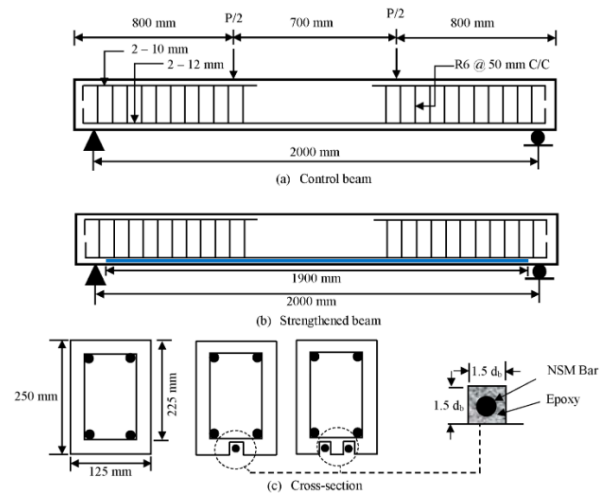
Testing arrangement, dimensions, and reinforcement details of the cross-sections of beam specimens strengthened with NSM reinforcing bars (NSM Bars) [10, 11]
